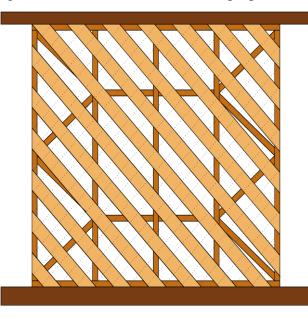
Timber plank cover (on both sides) of the proposed wall
